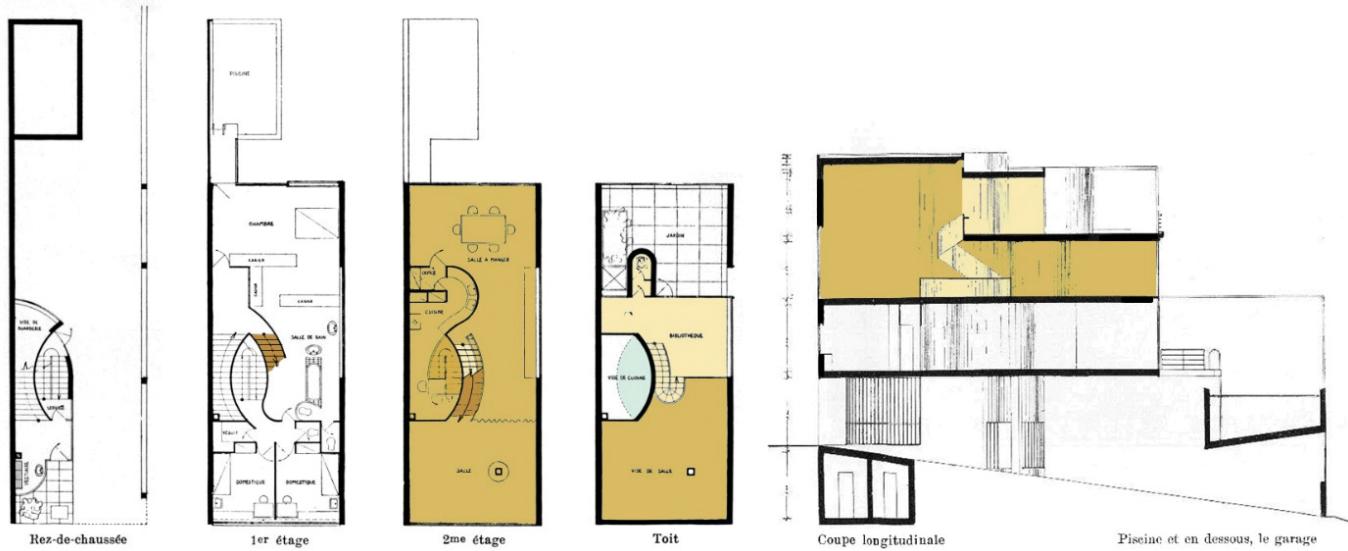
Maison Canneel – Floor plans and section © Oeuvre Complète
